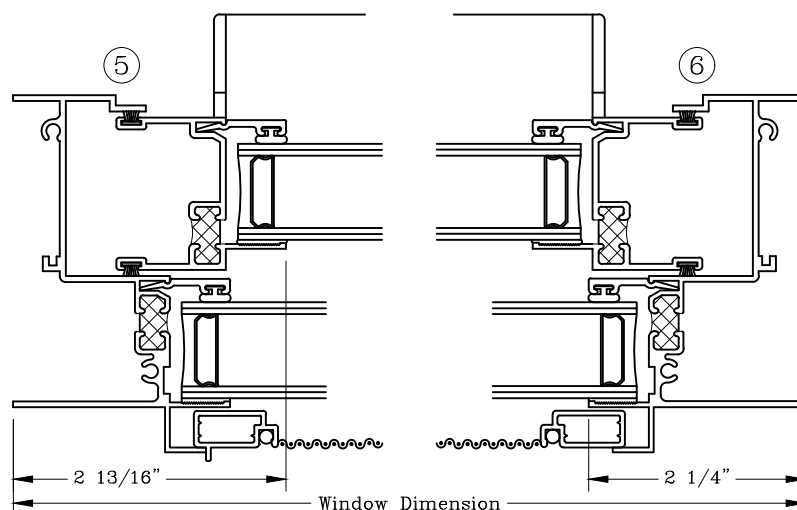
/2 Scale - For Custom Size Drawing Contact Graham
